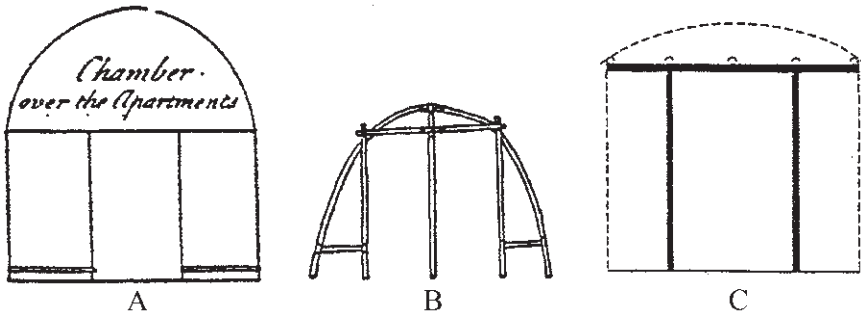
Northeastern American longhouse cross sections (from Snow 1997:77)
